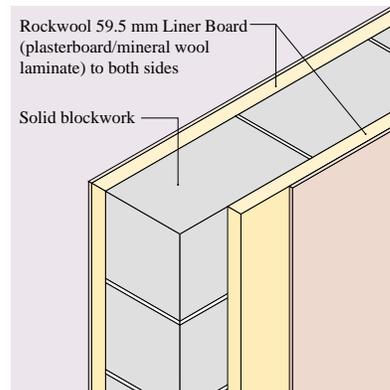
Rockwool Liner Board for upgrading existing cavity block party wall
